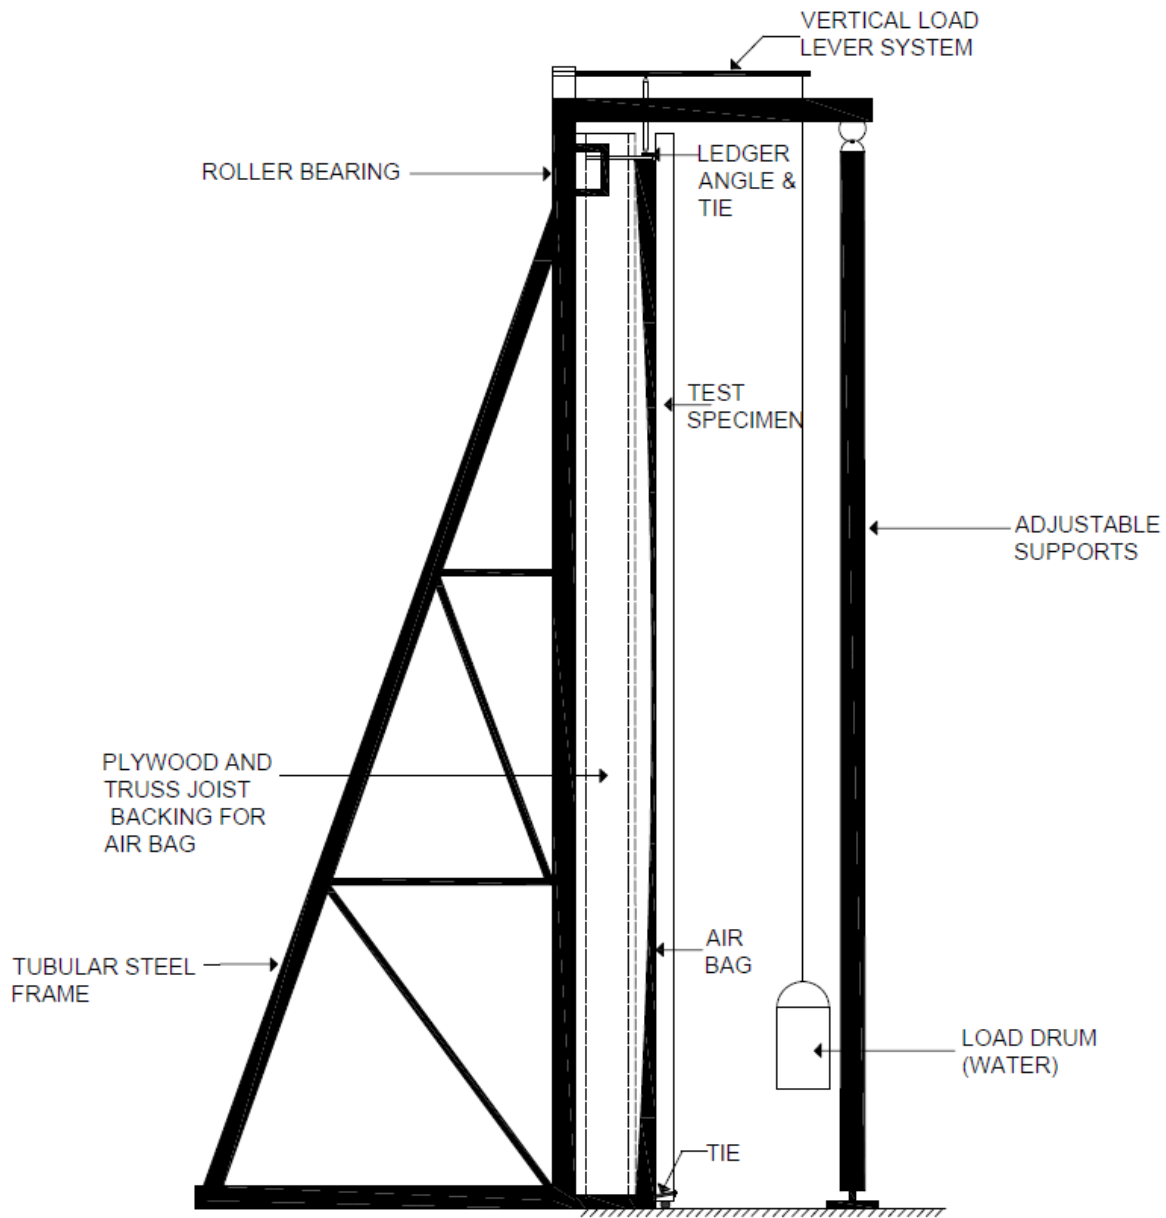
Side Elevation of Test Setup – Loading Frame Showing Drums of Water for Vertical Load and Air Bag for Lateral Load.
